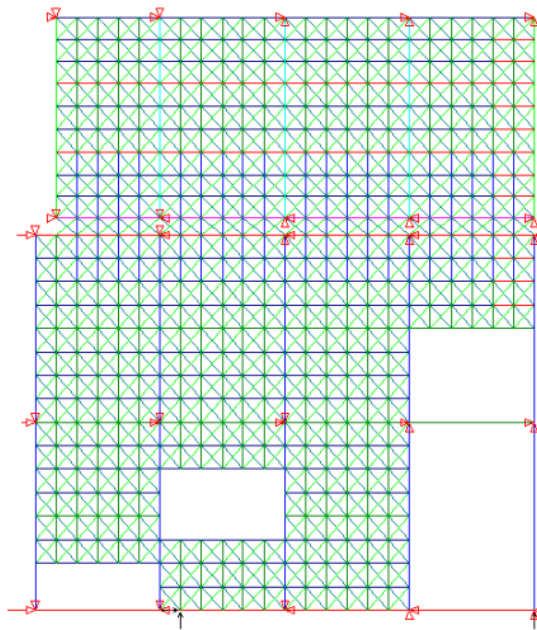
Truss model assigned to a typical floor diaphragm (Holmes Consulting Group 2014)
